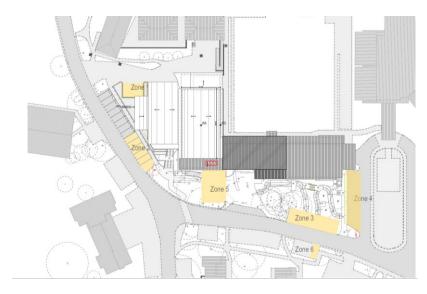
Proposed Parking Amendments Source: McNally Architects, Planning & Co.
